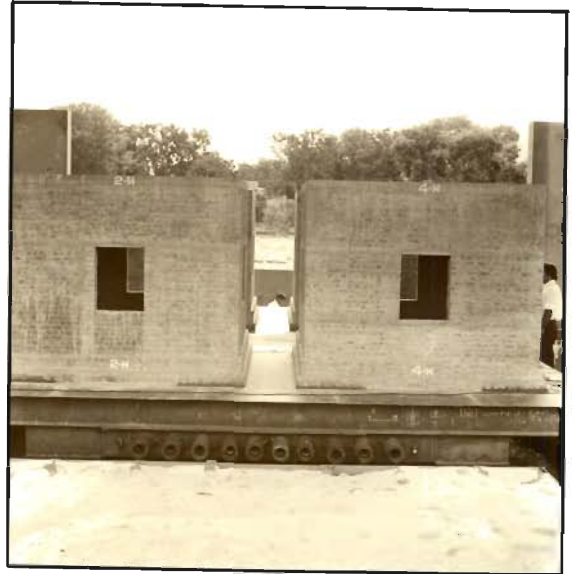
\_ MODELS 2 AND 4 (STRENGTHENED IN MUD AND CEMENT MORTAR) BEFORE SHOCK LOADS
